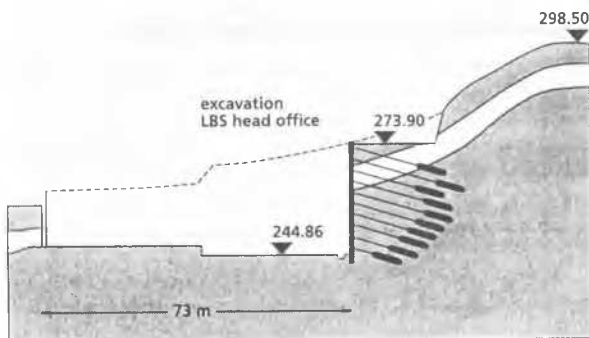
Cross-section of the 10-fold anchored bored pile wall
